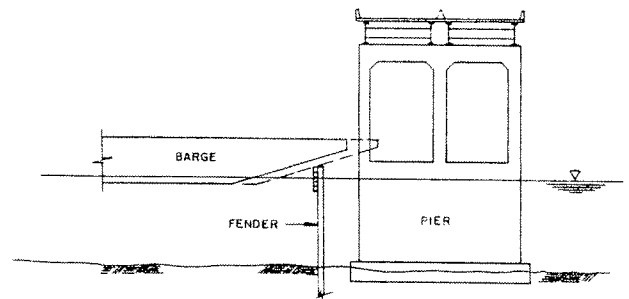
Elevation of Barge Bow Impacting Pier.
